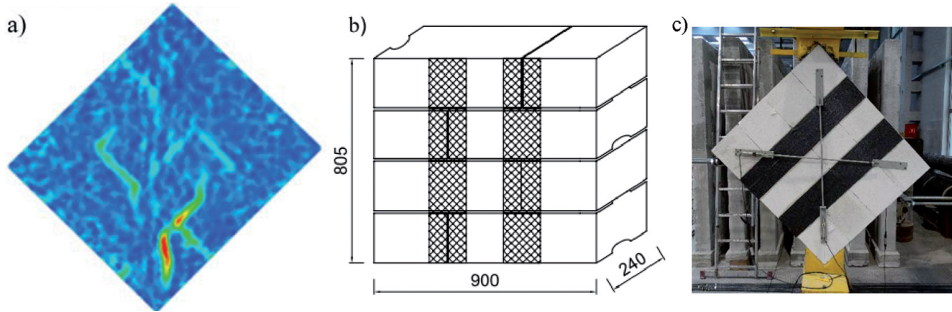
The characterization of the tested walls: a) the strain concentration in unstrengthened wall, b) arrangements of the FRP strips, c) strengthened wall in test stand
